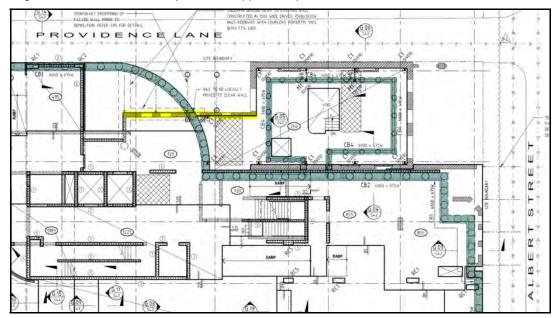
Basement pile wall location in respect to the retained walls of the service wing of 364 Albert Street. The basement pile locations intercept the retained wall resulting in piling close to and under the approved retained wall.
